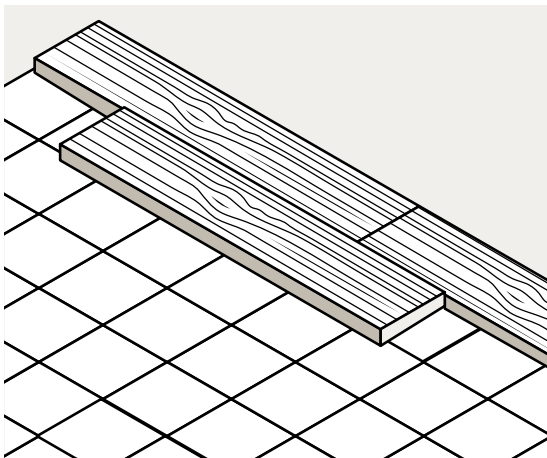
Engineered and solid wood floor can be installed directly over tiled surfaces.
